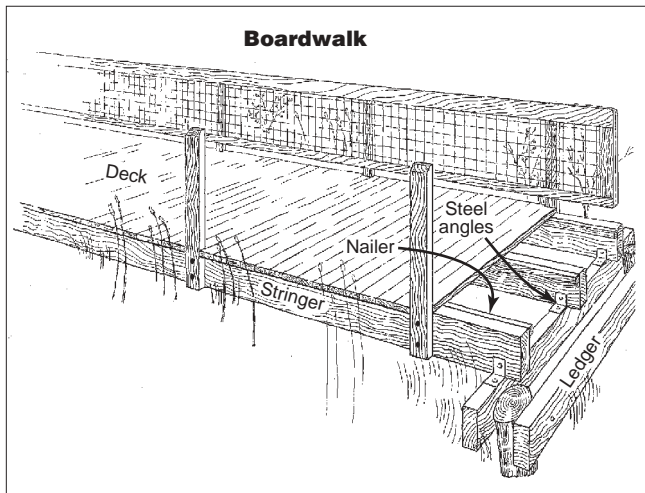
Details of boardwalk construction. Large stringers and ledgers connected with steel angles and nailers help increase the life of the stringers.
